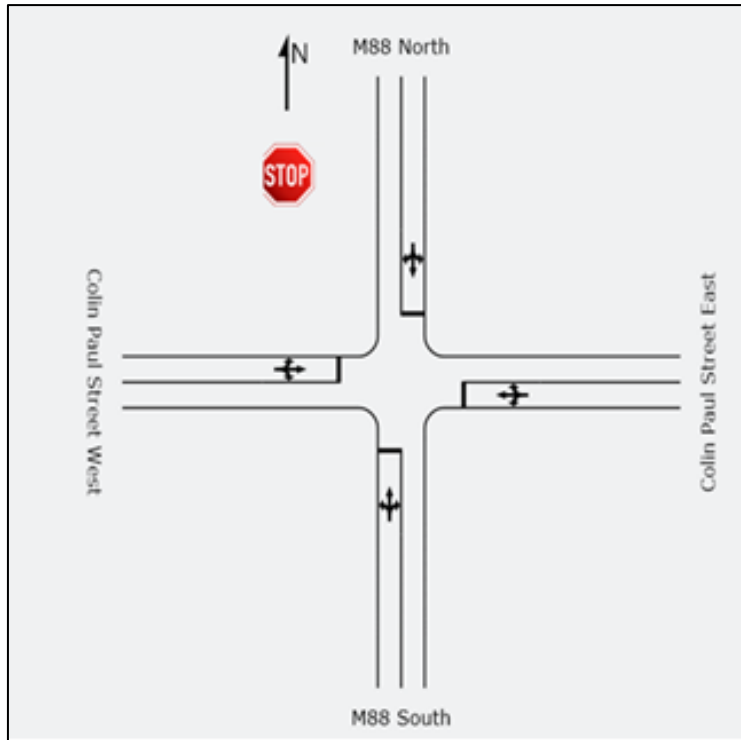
Existing layout for Colin Paul Street and M88 ( Rienert Avenue) intersection
